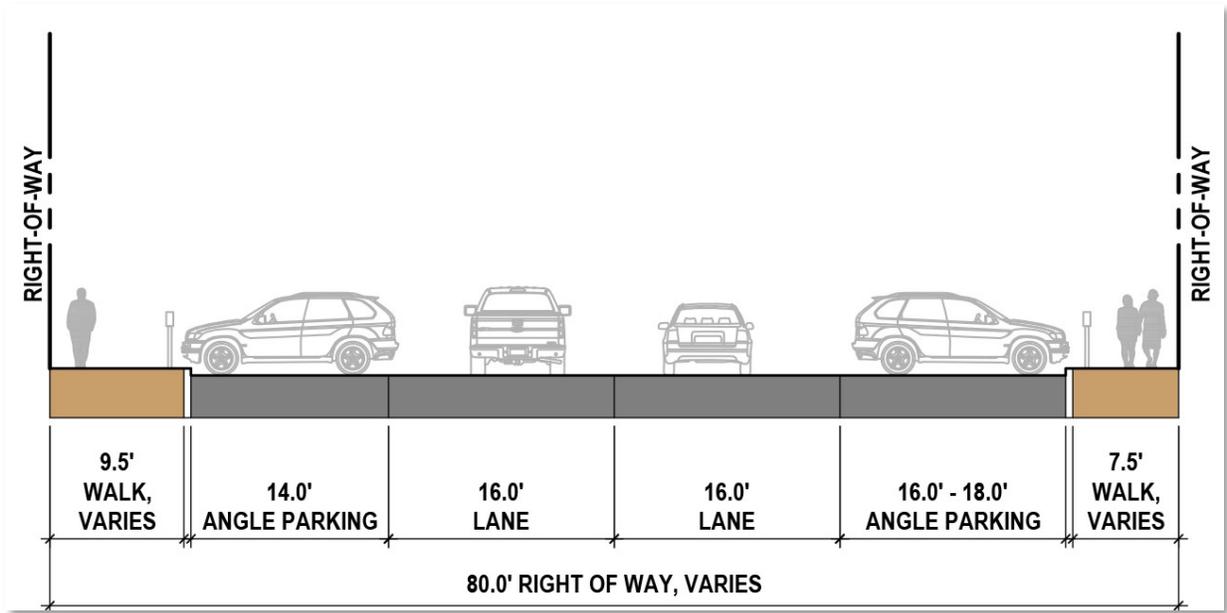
5th St - Existing Cross-Sections Between Rood Ave & Grand Ave
